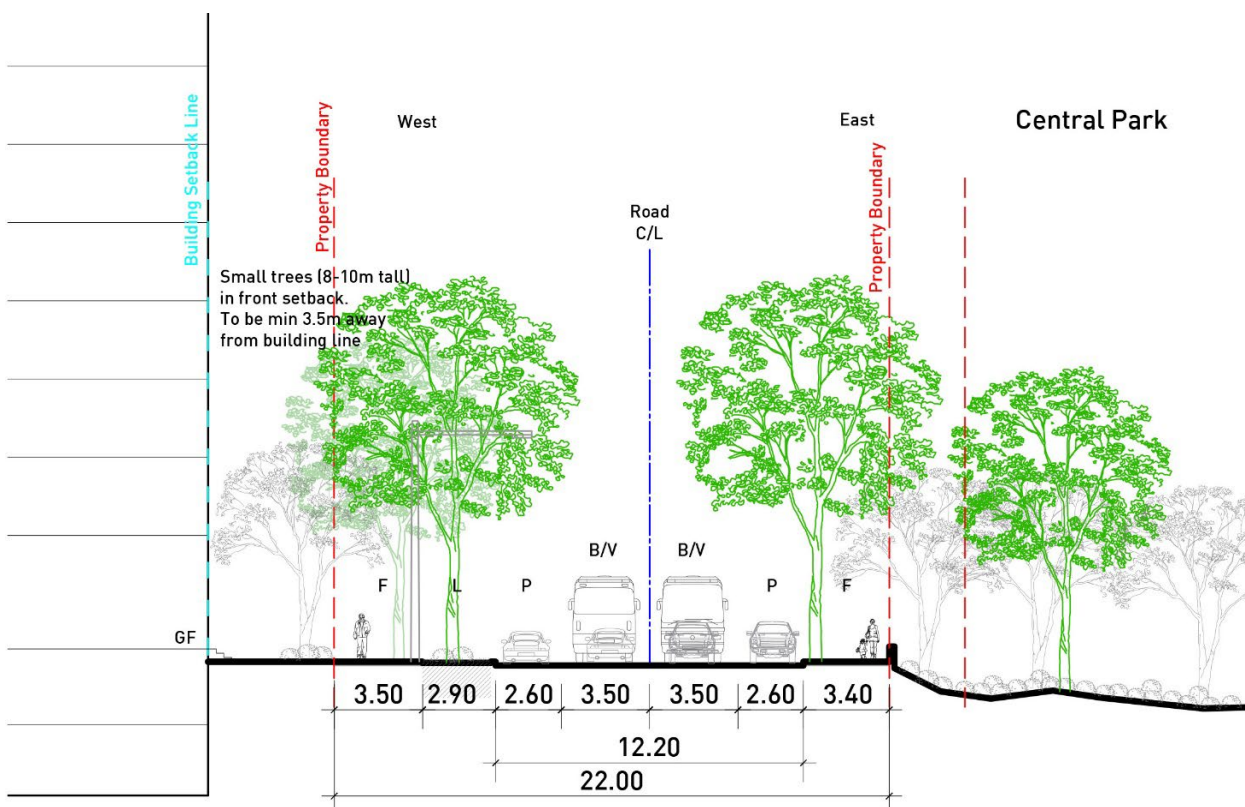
Type 1B Major Road Central Park Interface (NSR 2 between EWR 4 and EWR 6)
